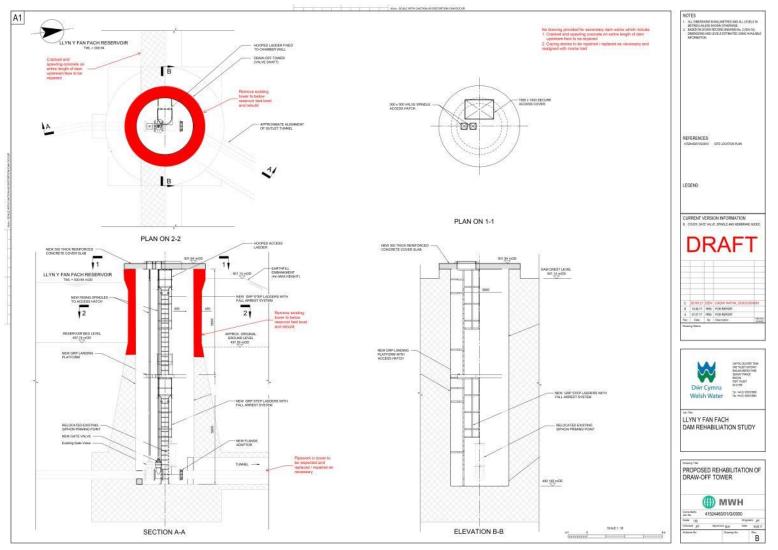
Proposed works on the reservoir dam tower. Plan created by MWH for Dŵr Cymru Welsh Water. Not reproduced to scale.
